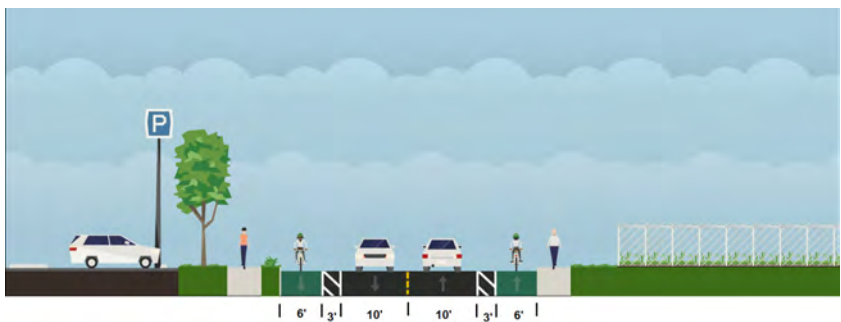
(b) - Proposed Cross Section: South Goebbert Road Buffered Bike Lane Concept
